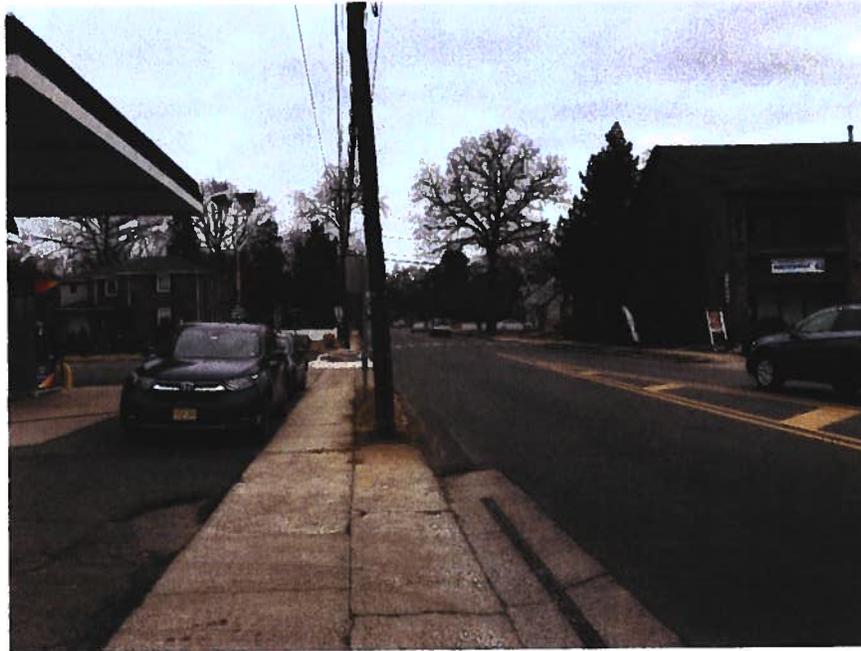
Photo from the southern corner of the property at the intersection of Central Avenue and Elizabeth Avenue facing north towards the eastern half of the property and the existing wall mounted sign along the principal structure.
